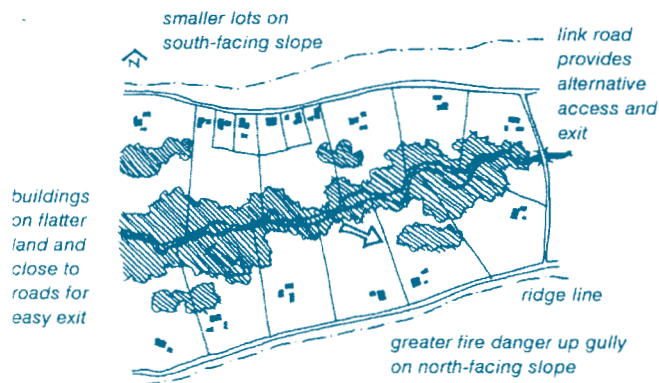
Road design, siting and lot layout in bushfire-prone areas.
